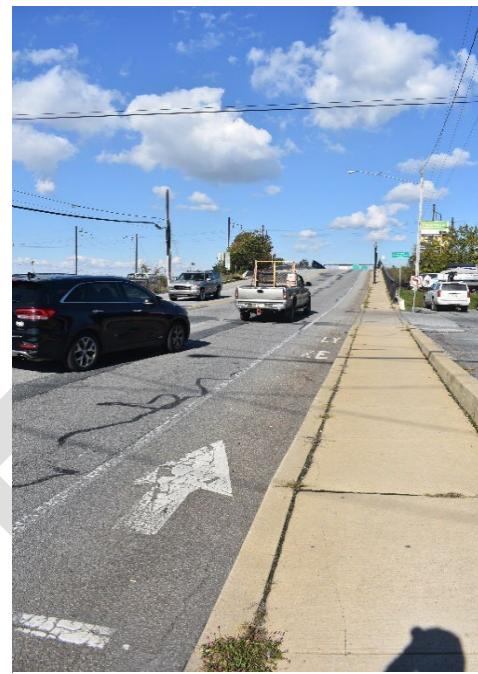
Approach to Fruitville Pike/N. Prince Street bridge looking north.
